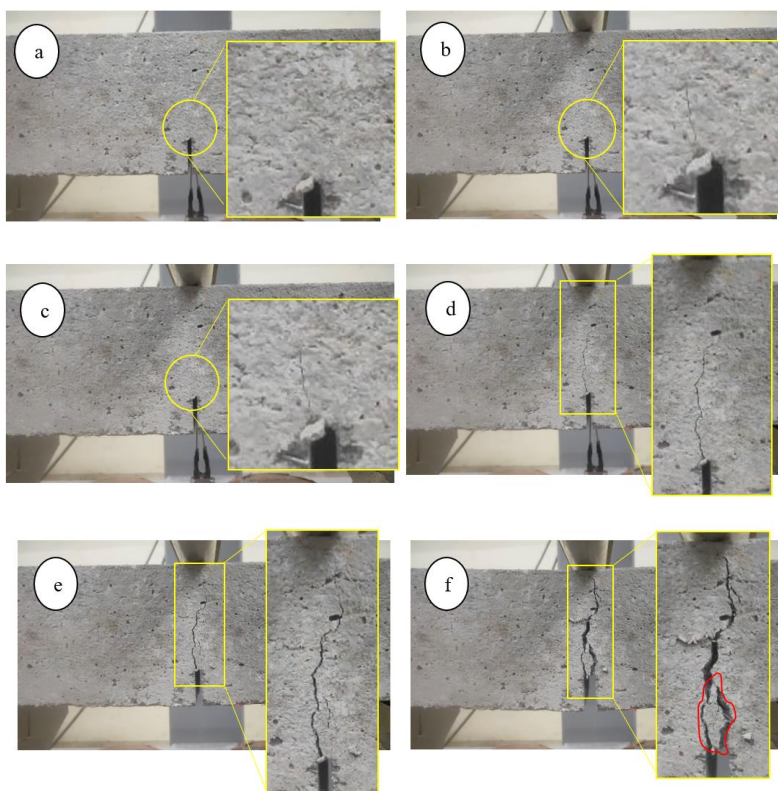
Crack propagation and crack pattern in hybrid fiber reinforced concrete
